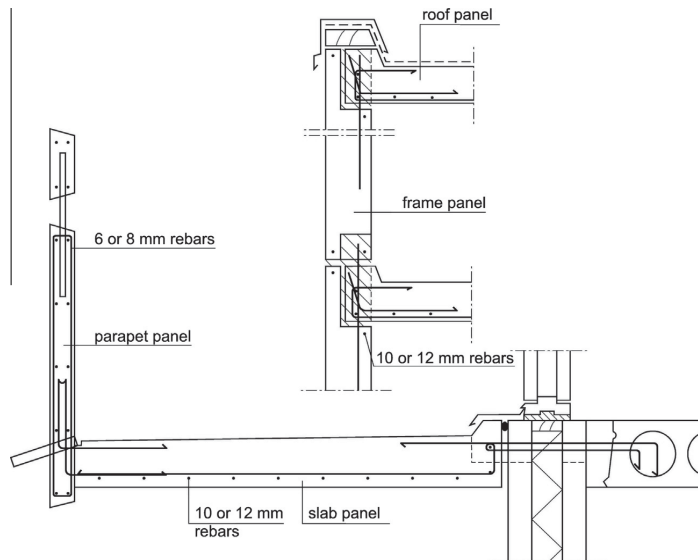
Cross-section of a typical Finnish balcony made of precast structural members [35].
